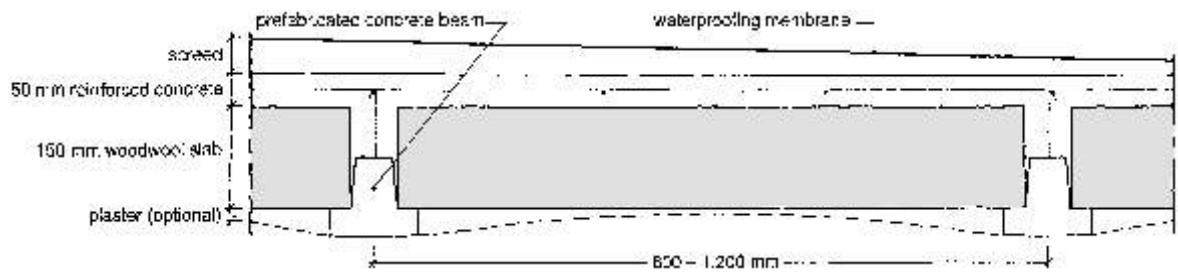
Flat roof with woodwool slabs laid between prefabricated concrete beams. A slab of reinforced concrete is cast over the woodwool slabs and beams. The ceiling can either be left as it is, which give good sound absorption, or plastered. (Using a 150 mm thick layer of woodwool slabs gives a U-value of 0.5 W/m²K).
